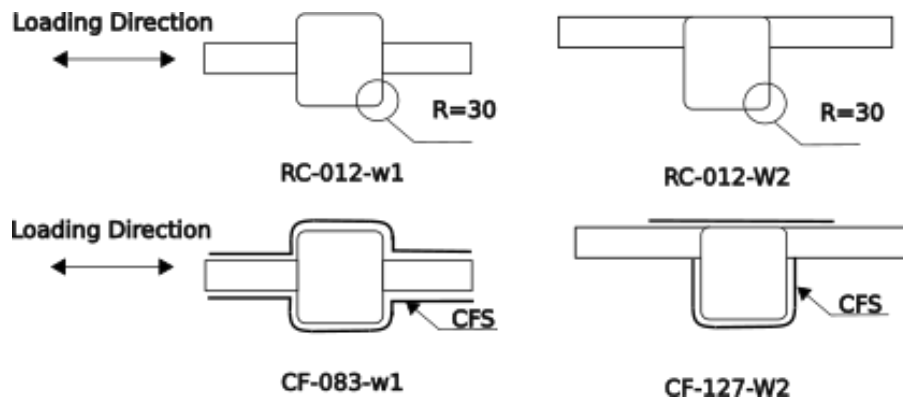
Examples of wing wall specimens tested (adapted from Sonobe et al. (1999))
